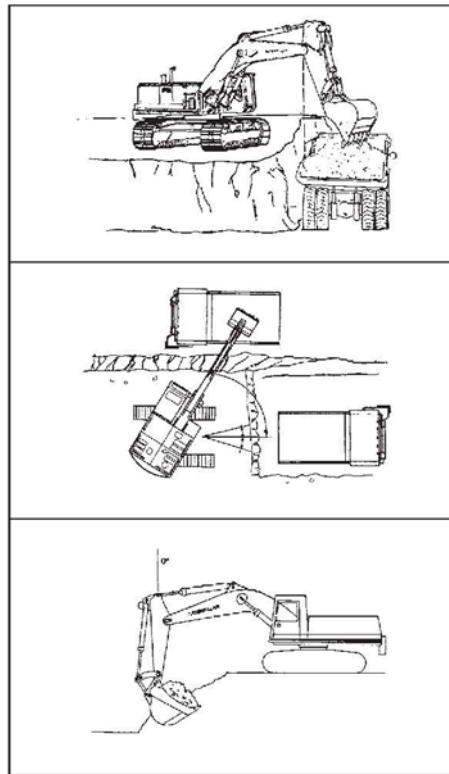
Schematic View of the Hydraulic Excavator Loading a Truck
